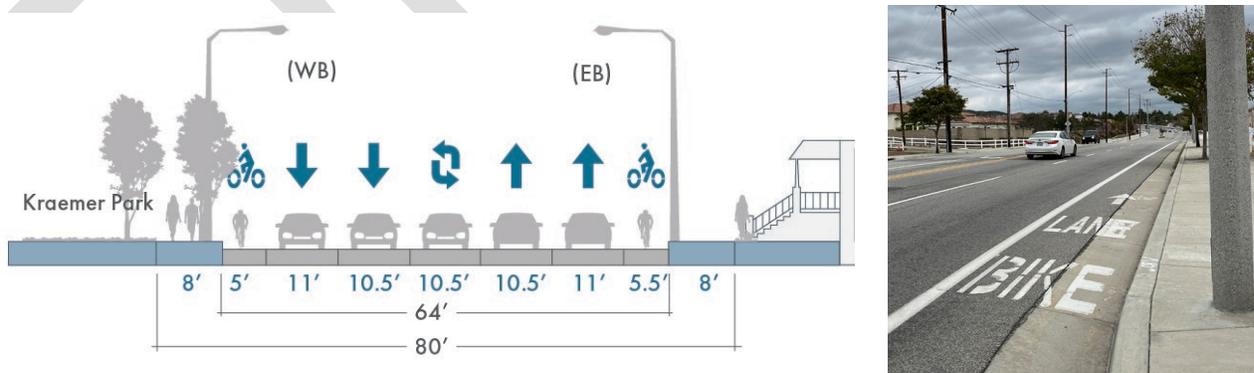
Proposed Street Section, Chapman Avenue East of Bradford Avenue
